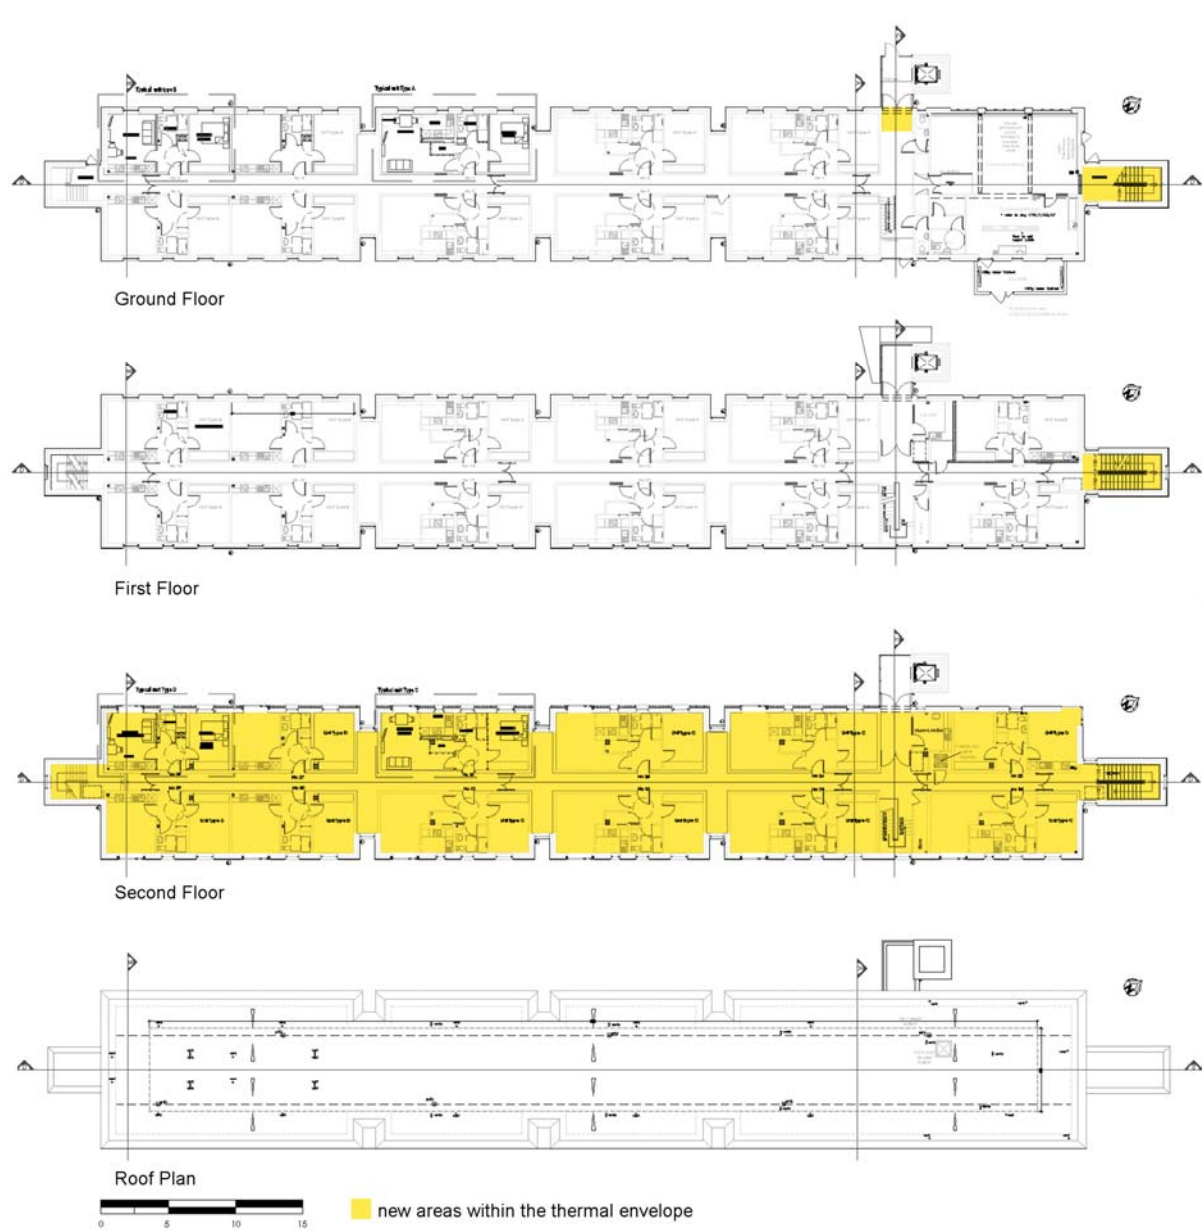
Existing and proposed floor plans [DLR Co. Co., 2014]
